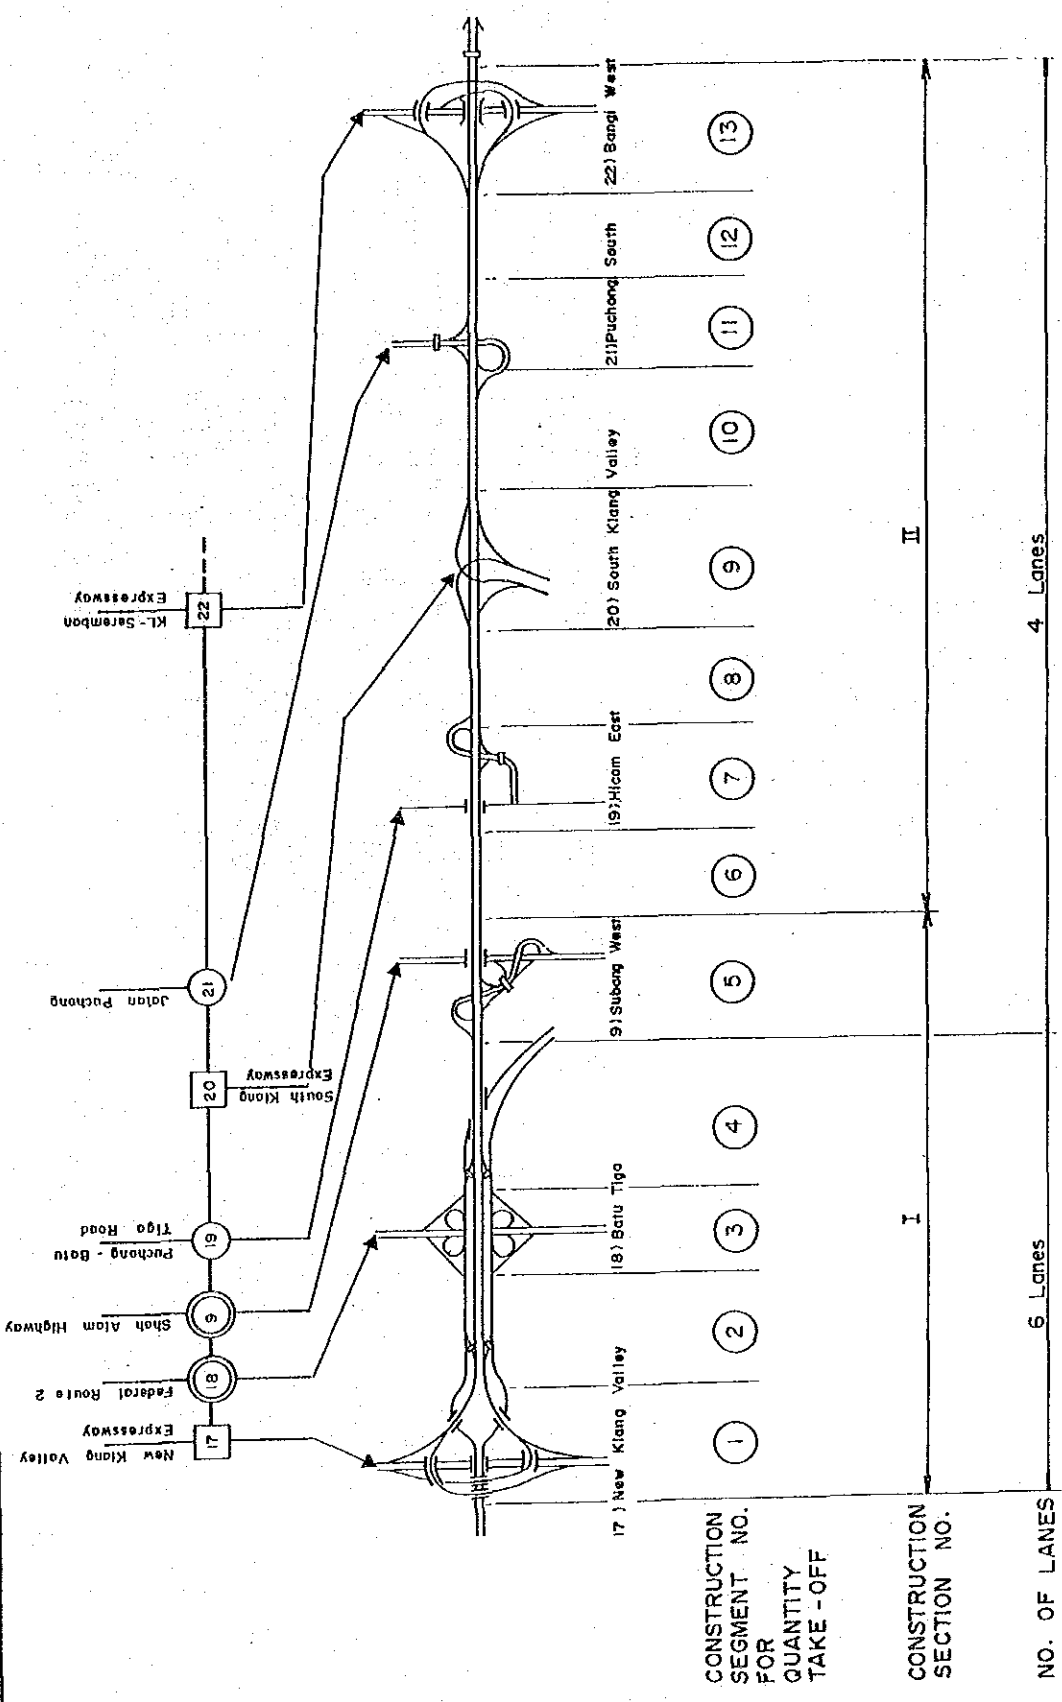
CONSTRUCTION SECTION & SEGMENT
